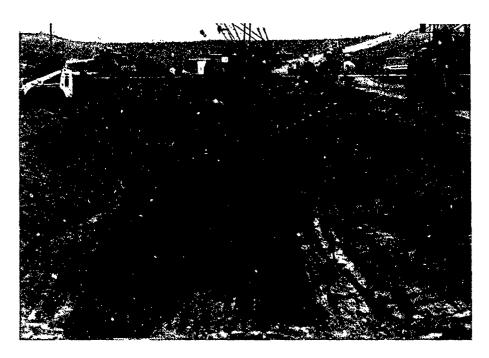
Hydropower conduit excavation showing gunite and aerospray application (looking upstream) Sta. 28+50 - 27+50.
